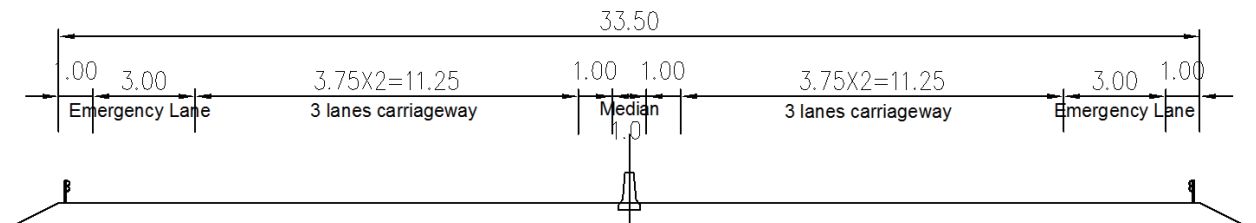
Width of Plan (Phase2:6-lane)
